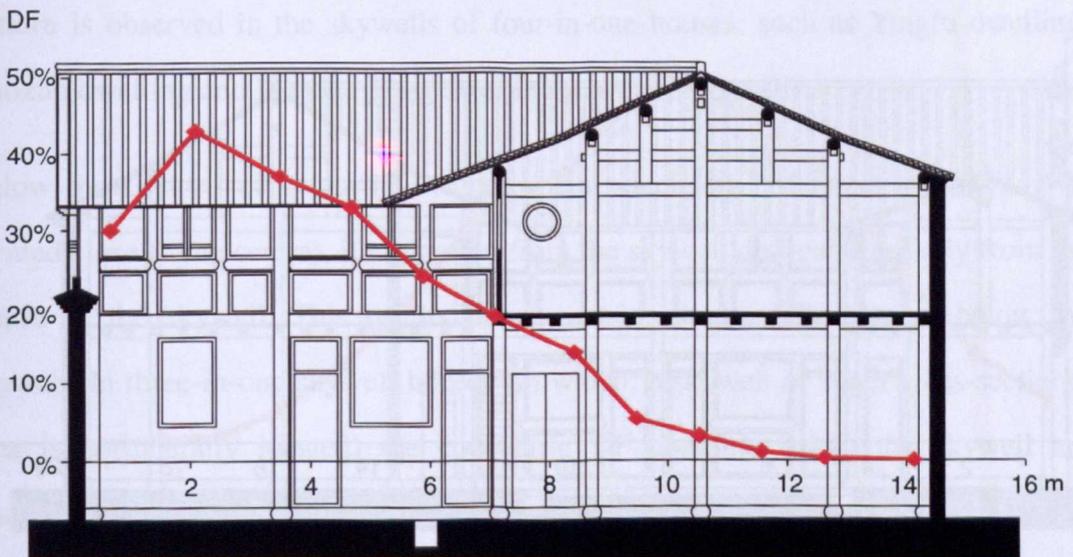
Section showing DF at 1m above ground floor level of Shuting dwelling
